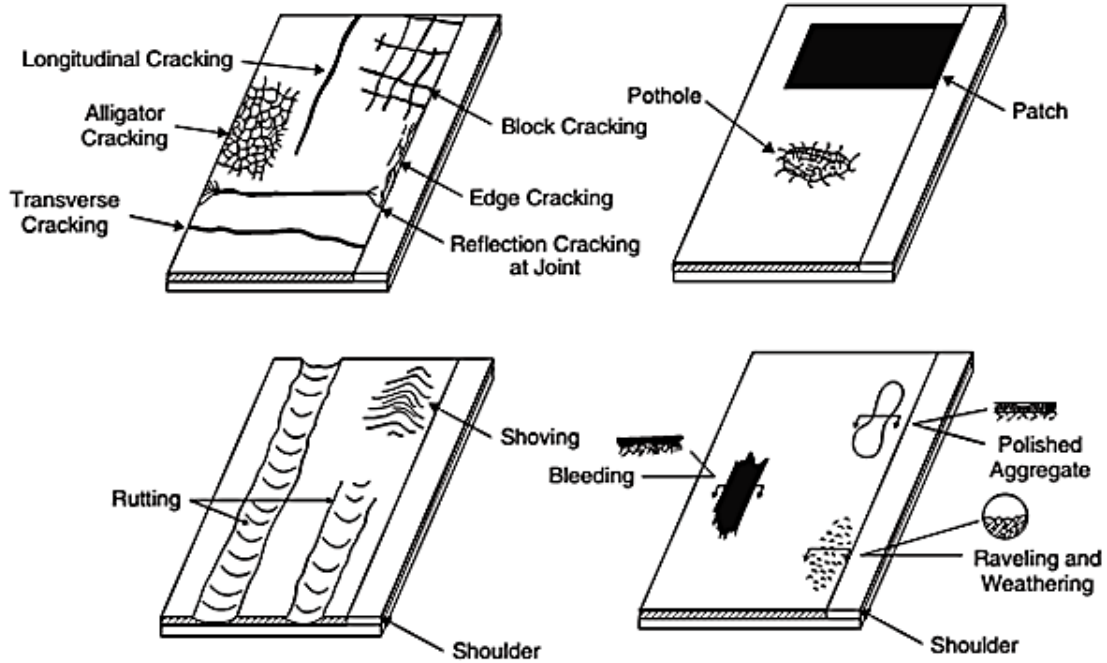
4: Schematic of distresses of flexible pavement (Miller et al., 1993)
